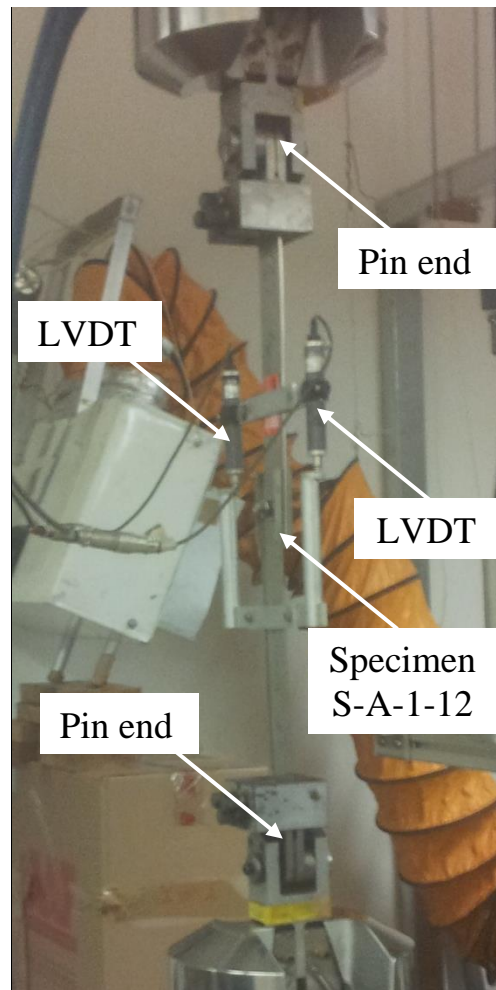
Test setup of stainless steel single shear bolted connection specimen
